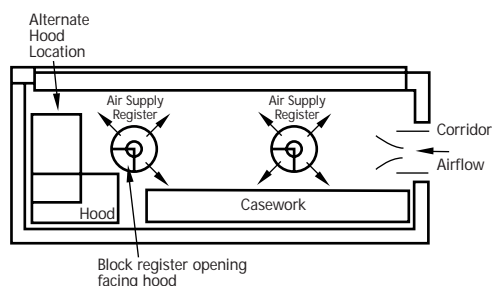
Laboratory layout showing hood located away from exits and potential airflow disruptions
